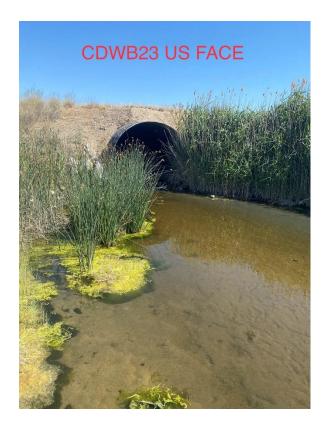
Looking downstream at CDWB23B I-80 9-ft CMP culvert.
